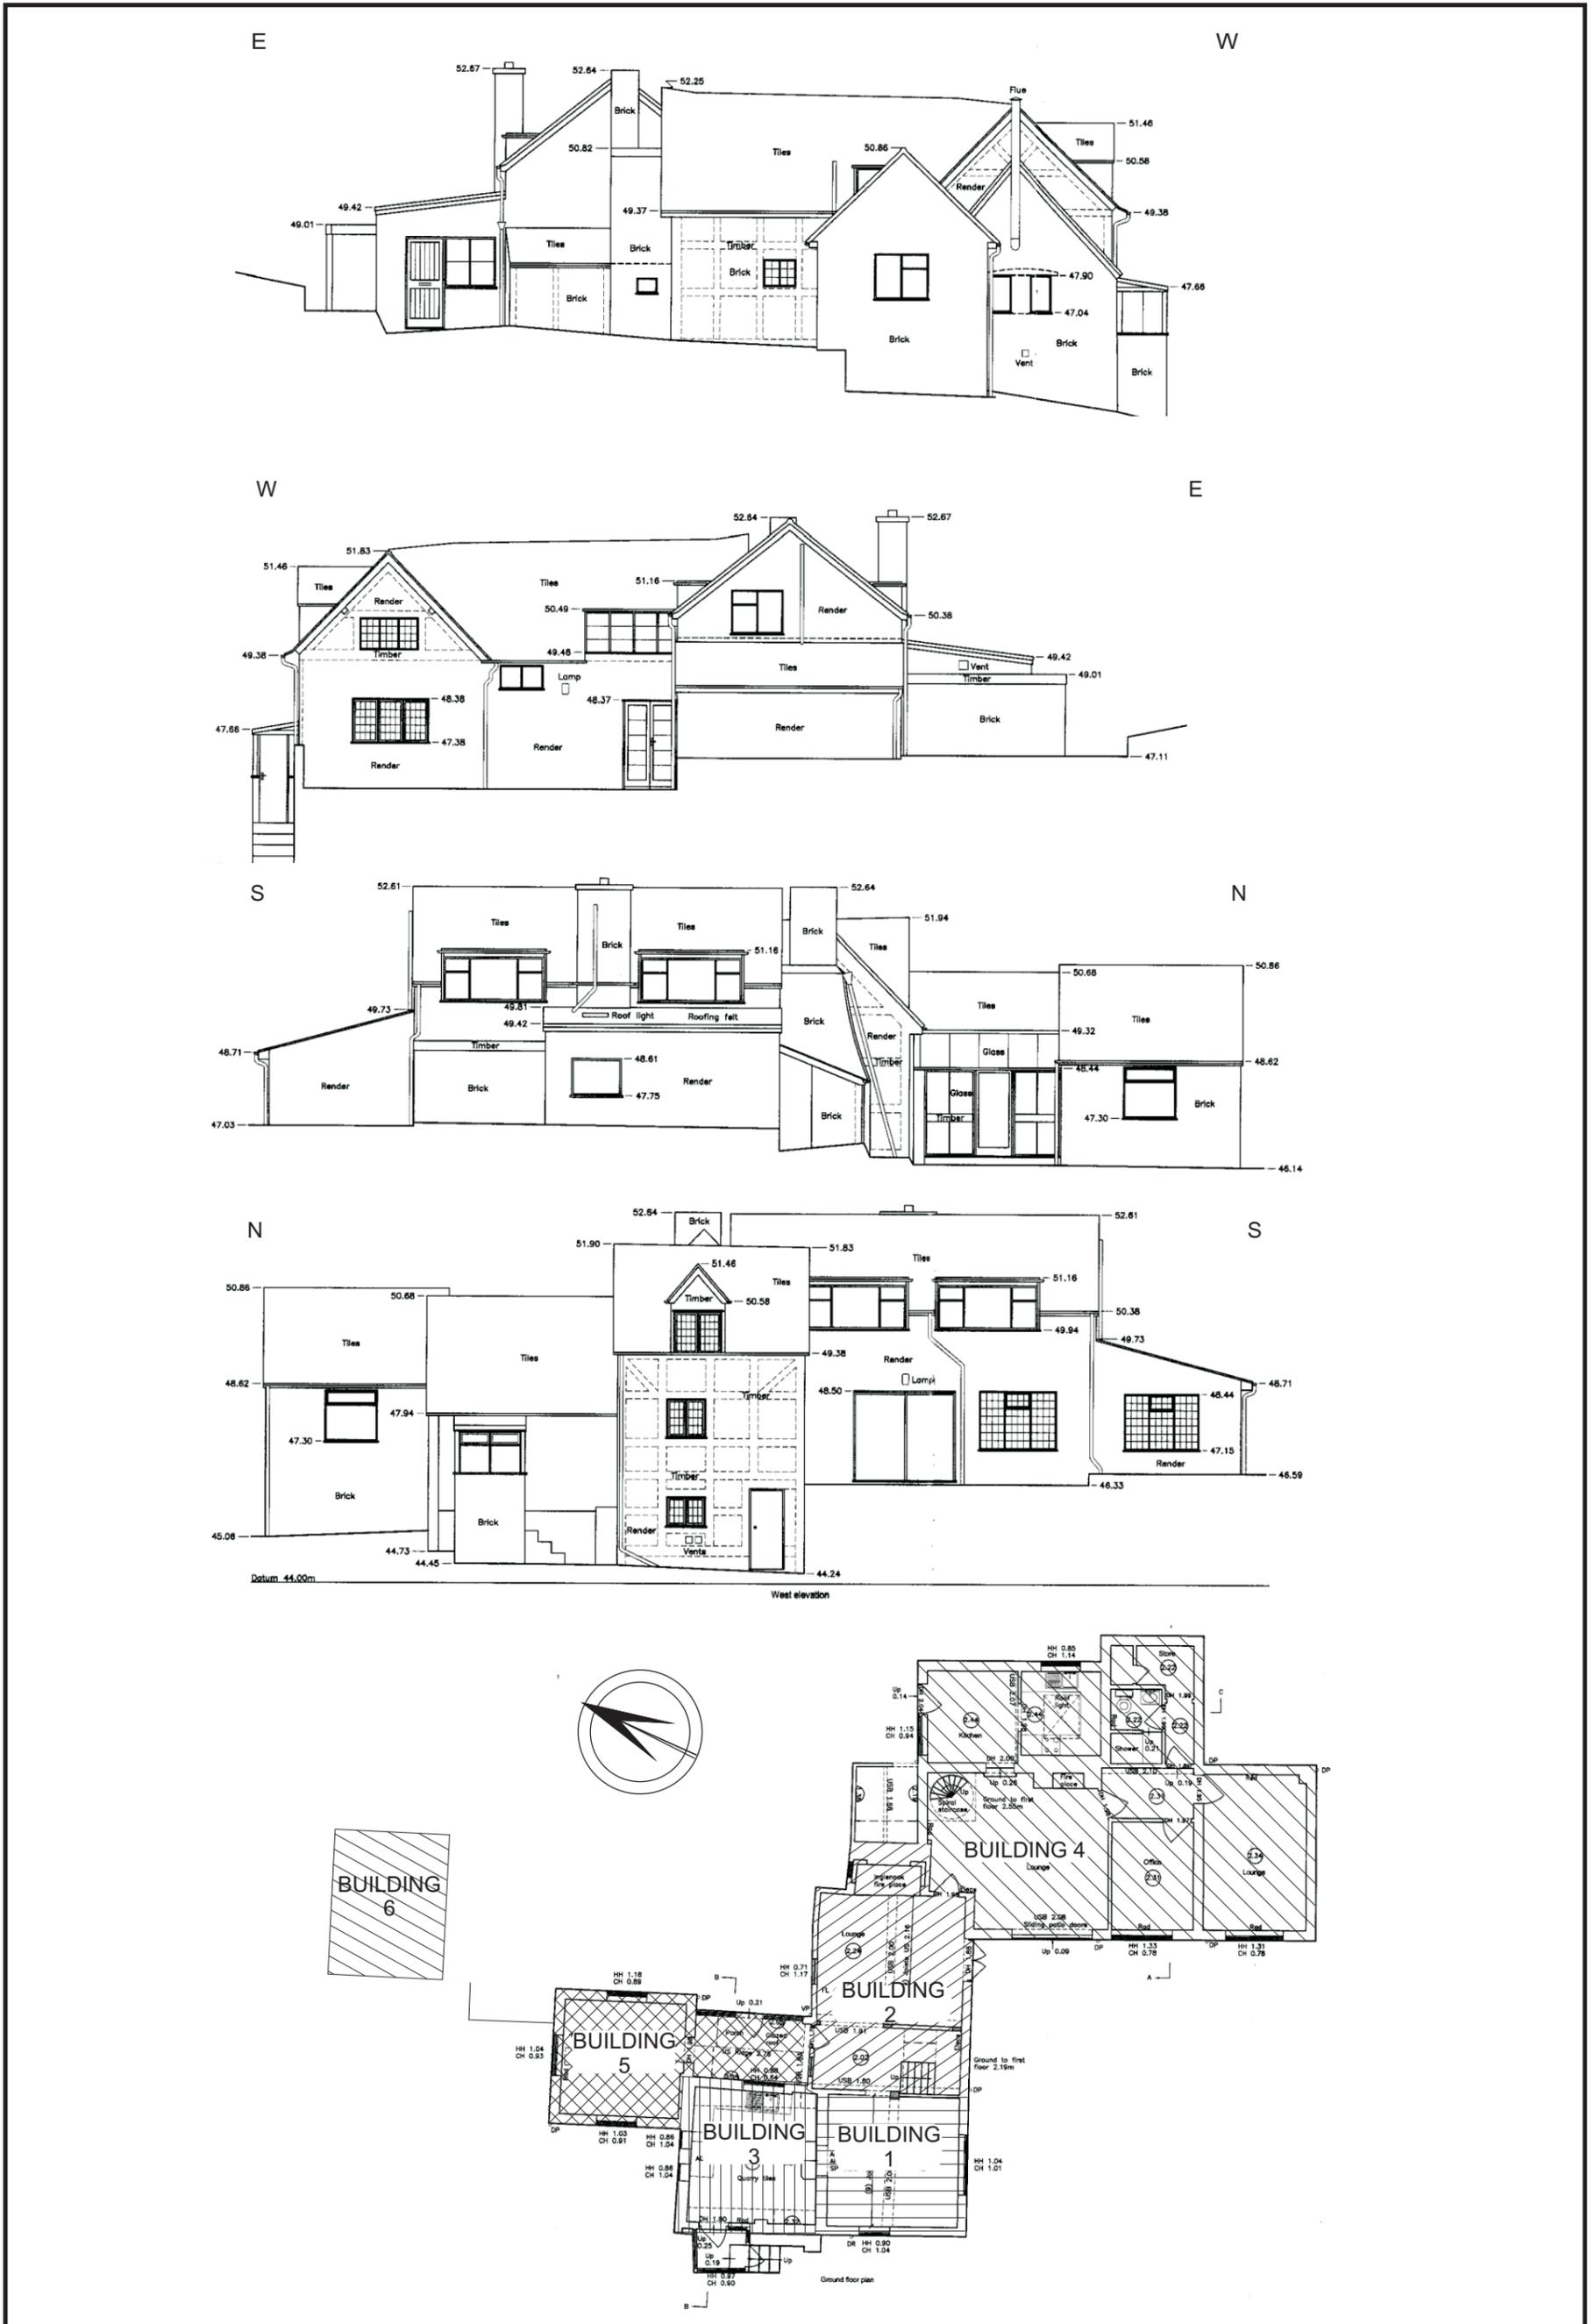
Architects survey drawings and key-plan (nb: only Buildings 1-3 formally surveyed, Buildings 4 and 5 were modern and Building 6 outside requirements of the Brief)
